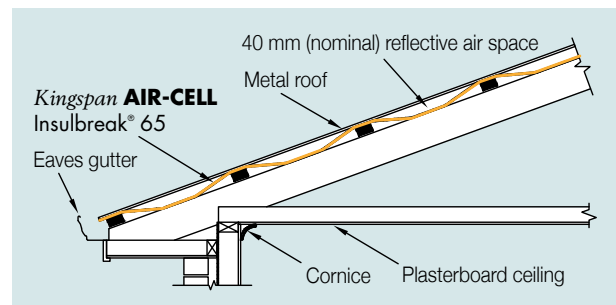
Side elevation of Kingspan AIR-CELL Insulbreak® 65 in a metal roof with a flat ceiling
